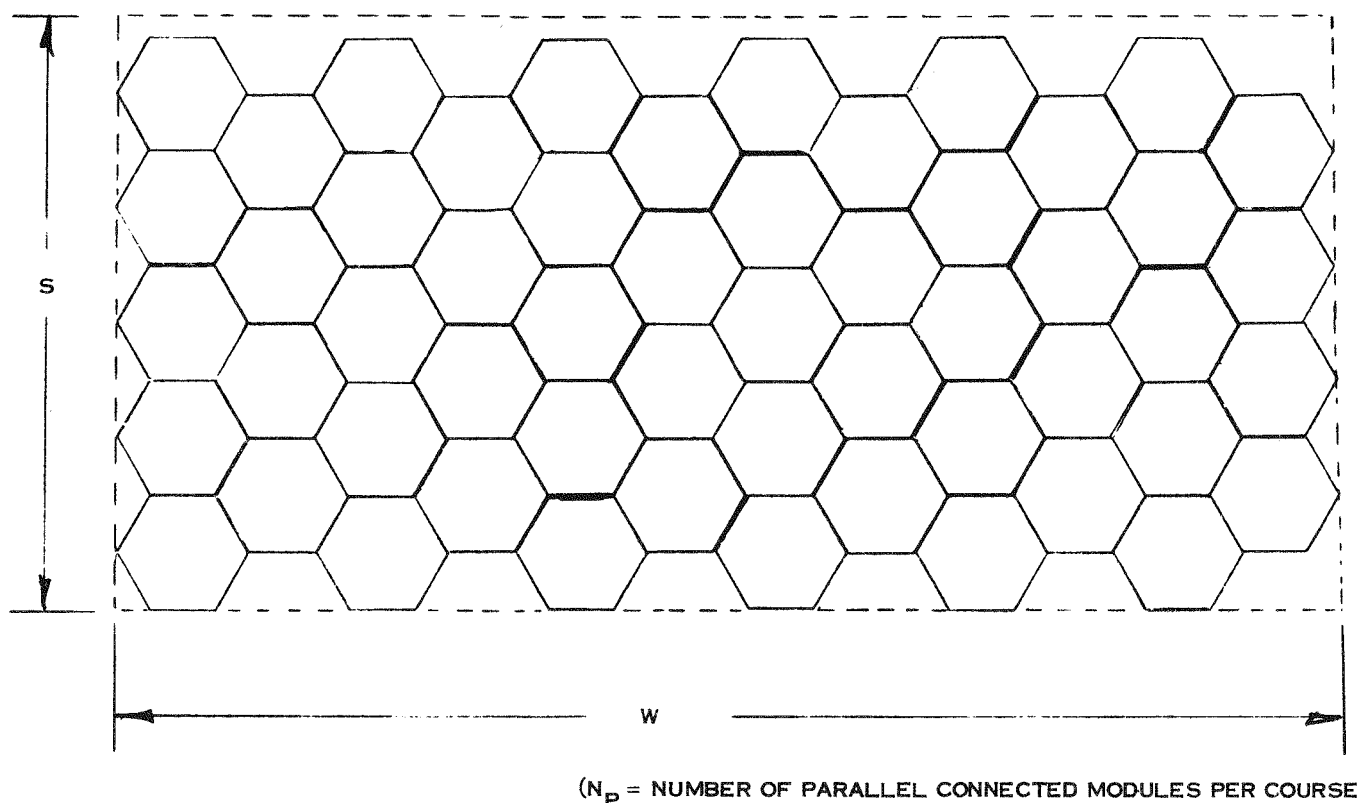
Arrangement of Shingle Modules on a Rectangular Roof
